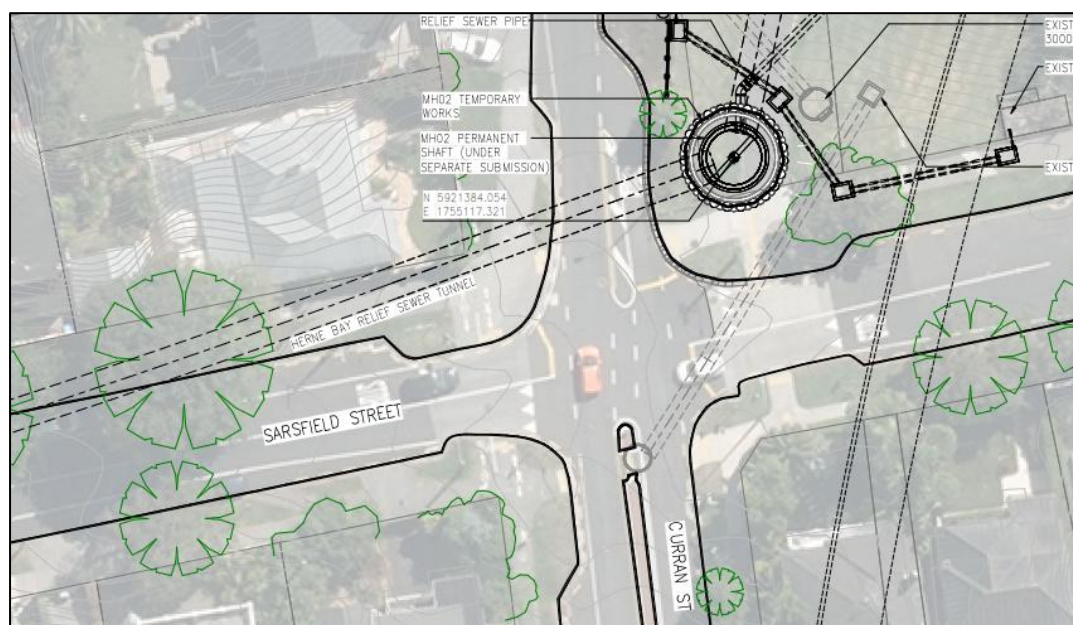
Proposed alignment of tunnel and shaft MH02
